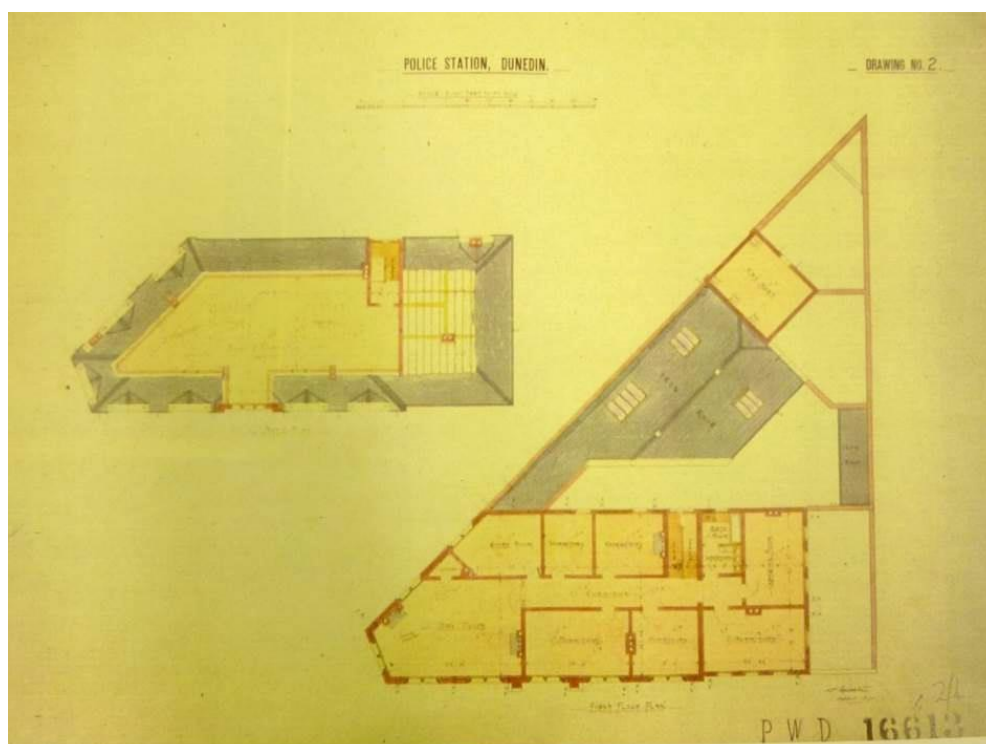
First floor and attic plans, Dunedin Police Station. Public Works Department 16613, Drawing 2. (Source: Dunedin City Council Archives).
